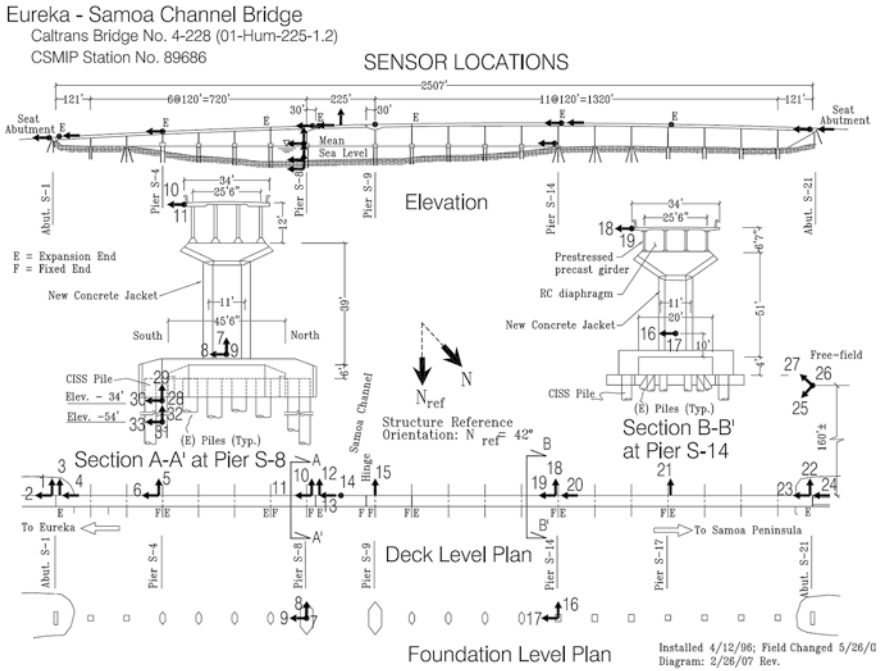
Instrumentation layout of Samoa channel bridge (CSMIP)
